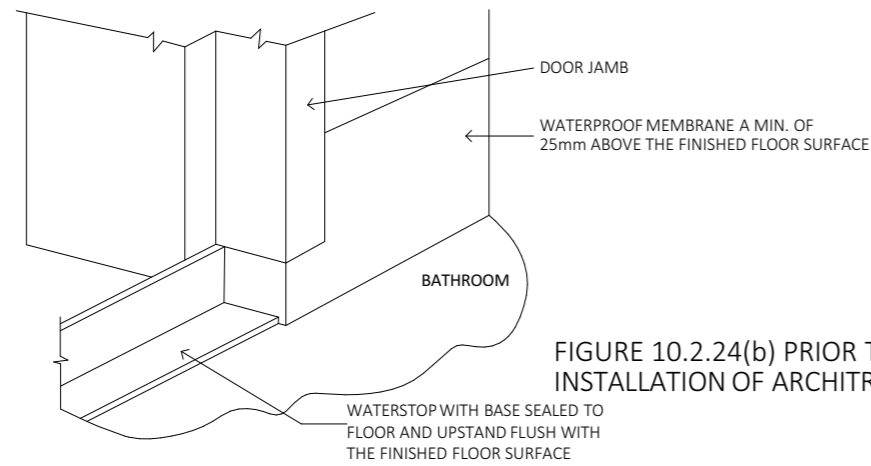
(b) PRIOR TO INSTALLATION OF ARCHITRAVE
